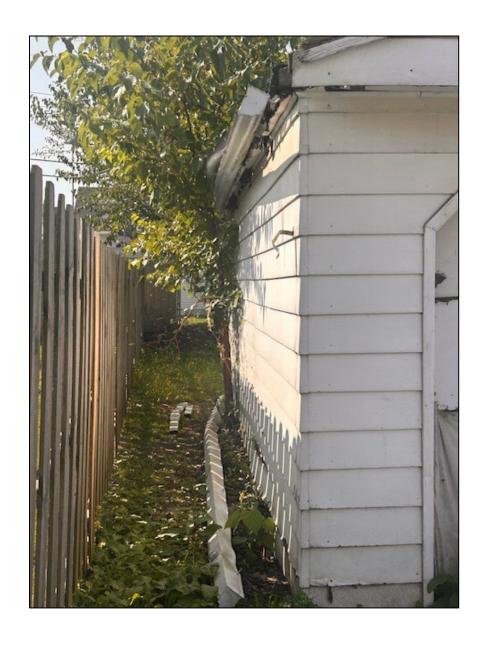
Garage, East Elevation, 23100 Ivan Avenue
